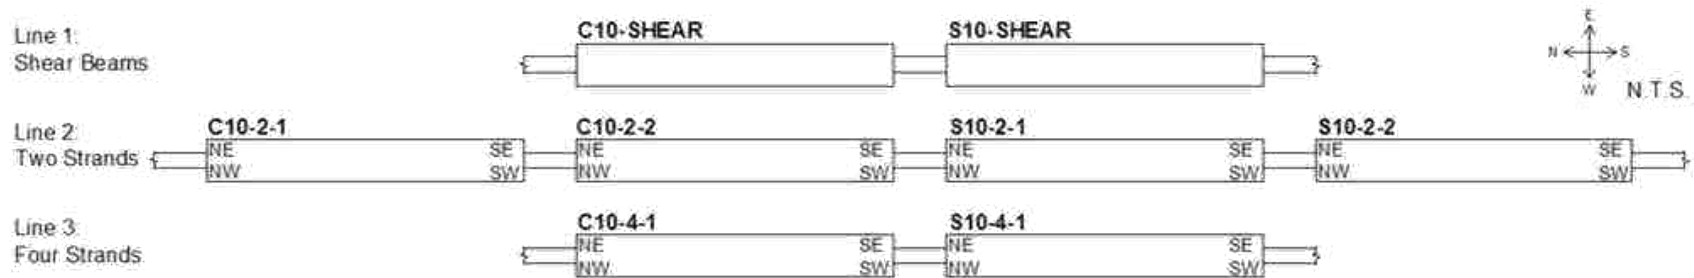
C10 and S10 Prestressing Bed Layout
